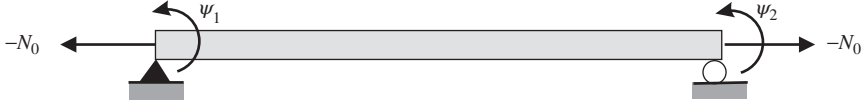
Modelling of the prestressed simply supported beam using one finite element.
